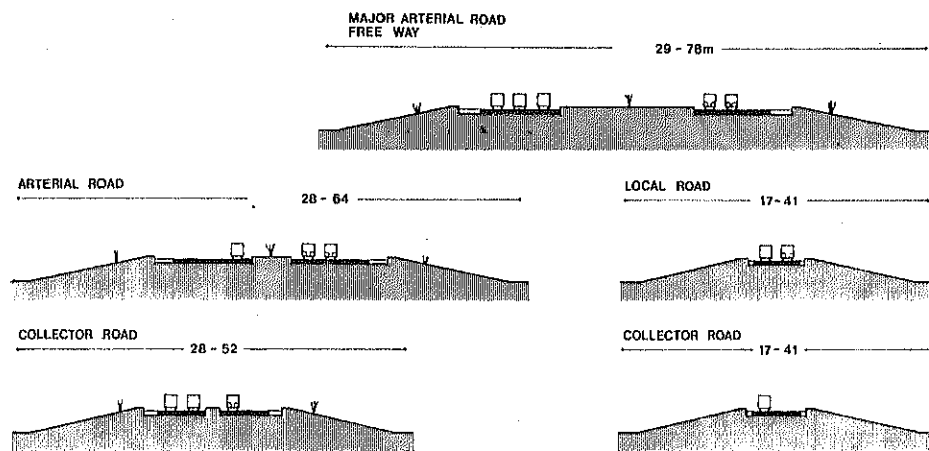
TYPICAL CROSS SECTION OF PRIMARY SYSTEM
